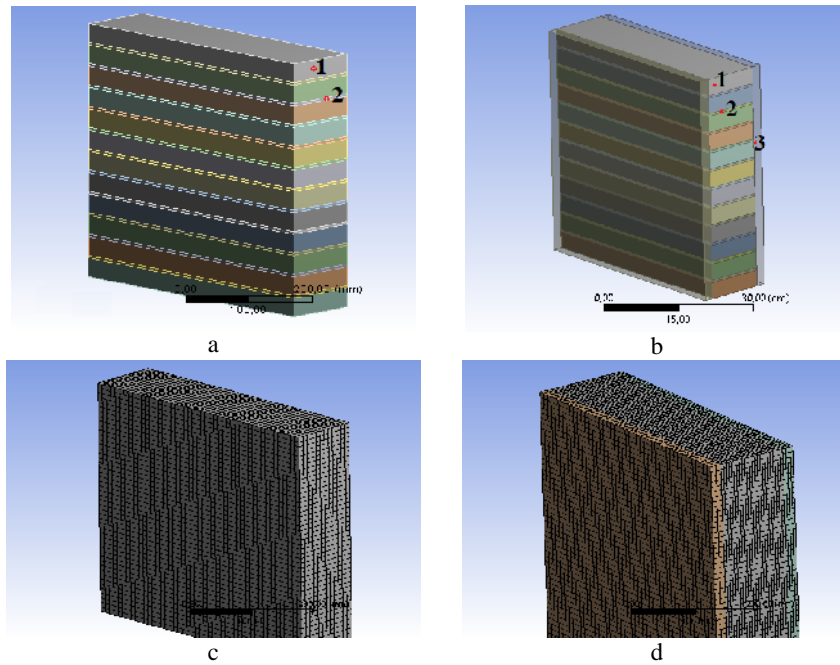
Numerical models analyzed: a - unstrengthened masonry (1 - brick, 2 - mortar); b - strengthened masonry (1 - brick, 2 - mortar, 3 - strengthening layer); c - homogenous simple masonry; d - strengthened masonry with 2 strengthening layers
